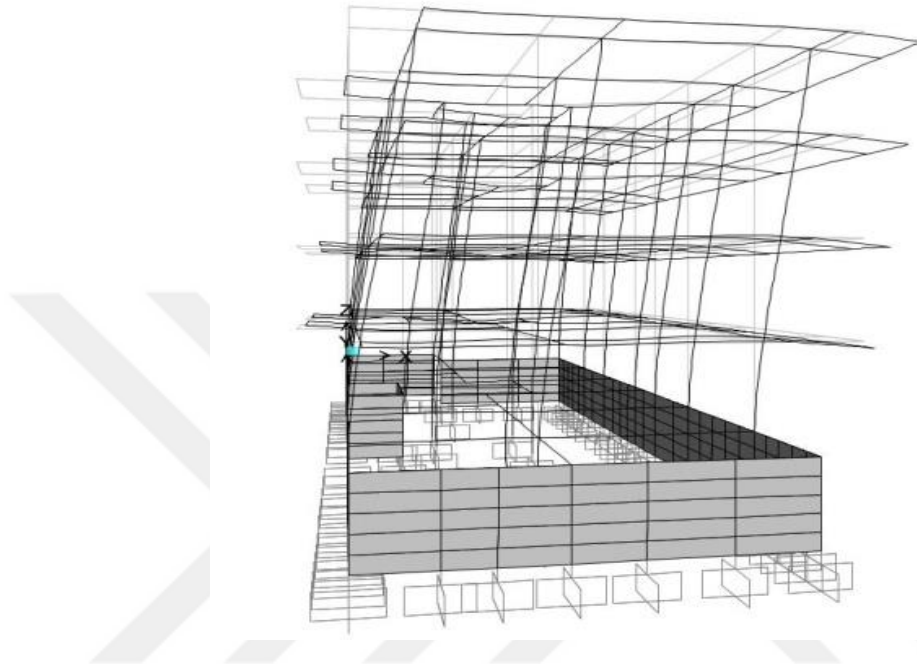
Deformed shape of the building under earthquake loading in the positive X direction.
